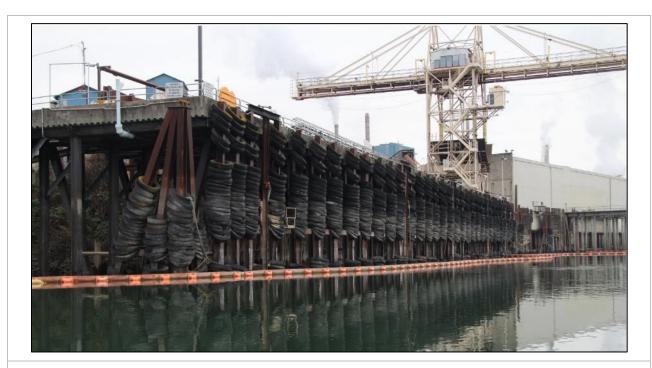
Conveyer housing in the vicinity of the Truck Dock, PECO Dock, and Dock Warehouse
